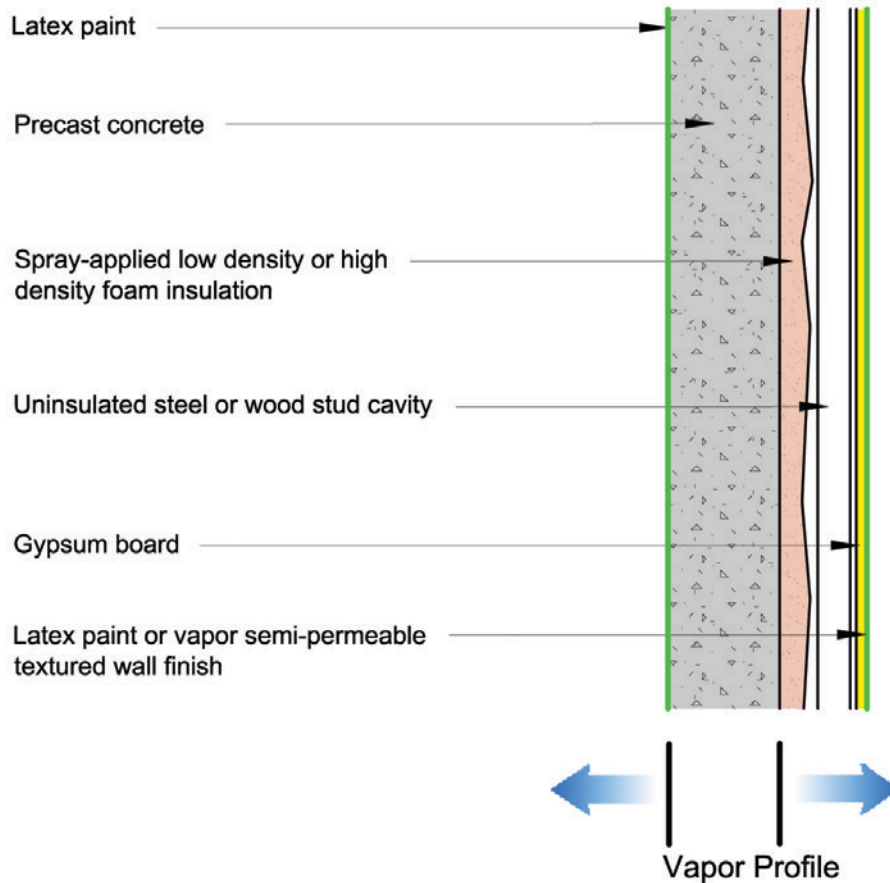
Precast Concrete with Interior Spray-Applied Foam Insulation
